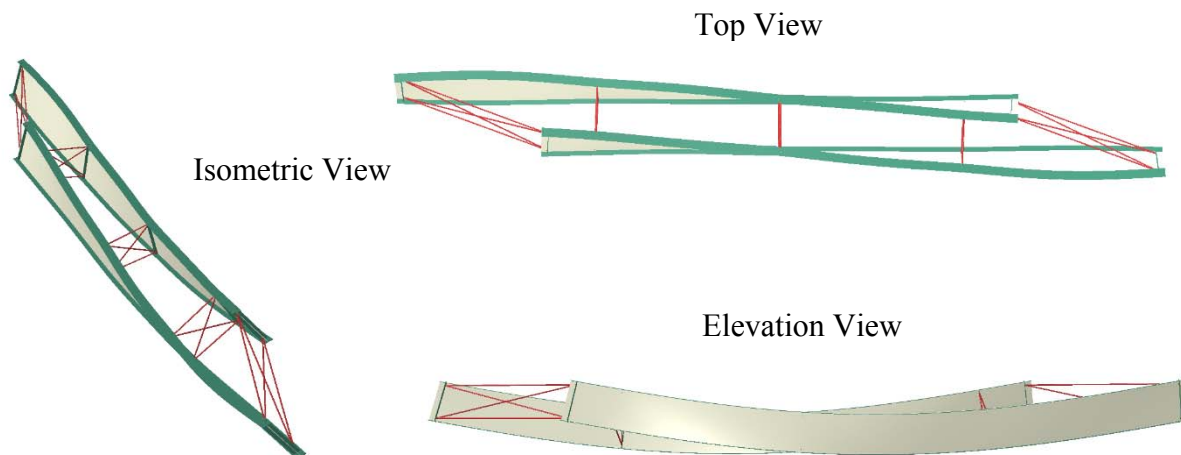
Magnified girder deflections for two straight I-girders, simply-supported on skewed bearing lines at their ends, and subjected to vertical load after interconnecting the girders by cross-frames.
